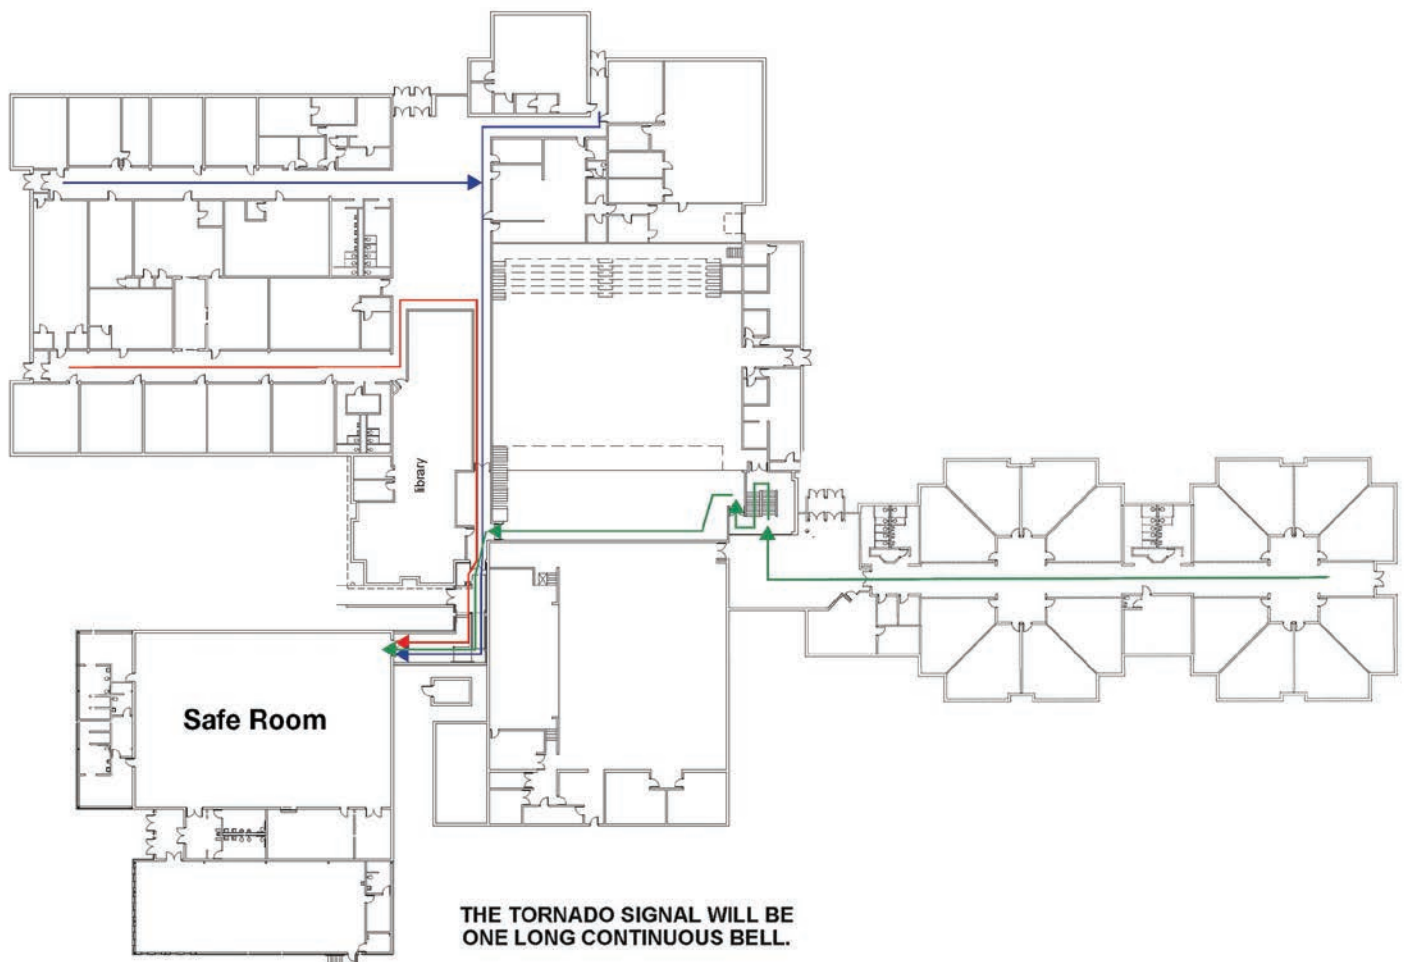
Example of a site plan clearly identifying safe room access routes
